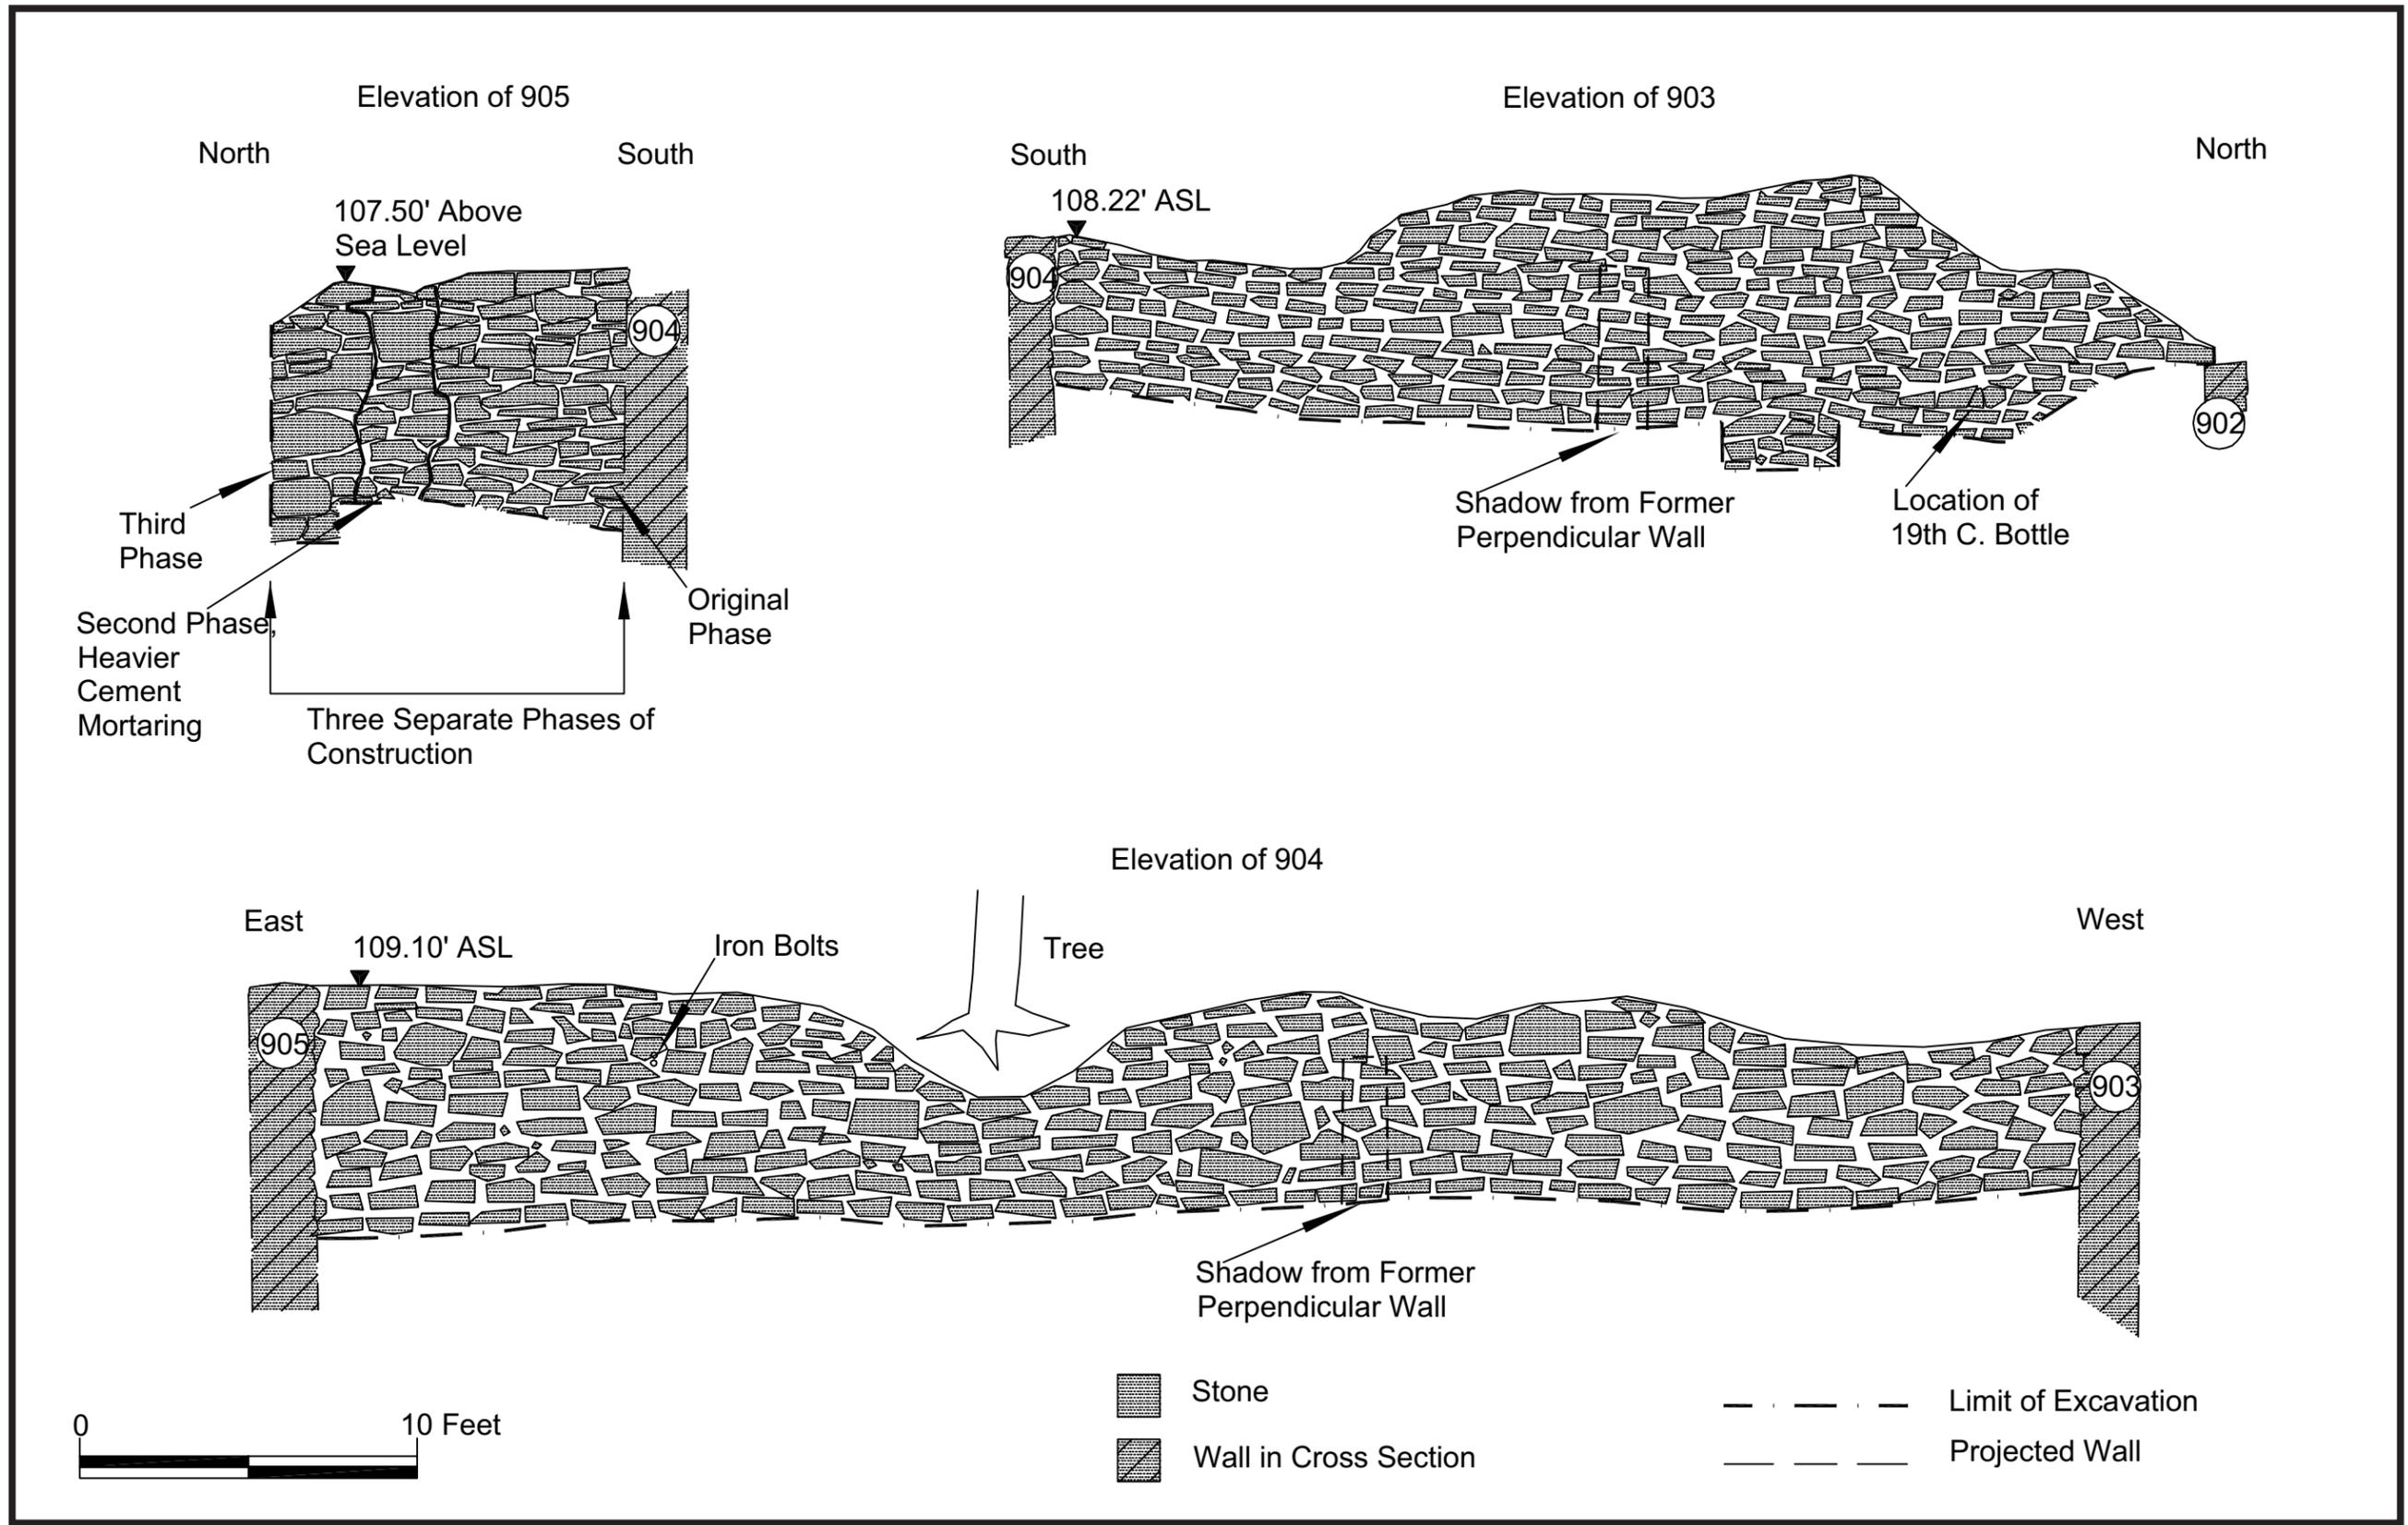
Profiles of Bank Barn Walls; Contexts 903E, 904N, and 905W.
